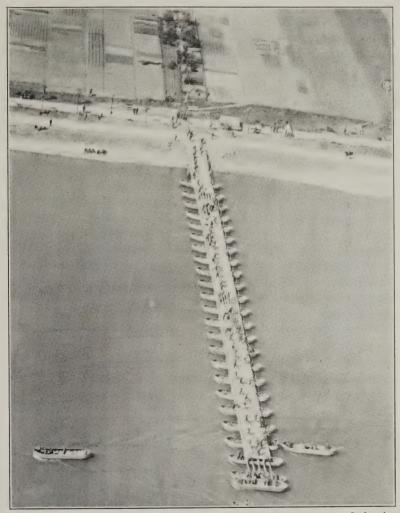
Photograph taken from the air at a height of 200 meters and showing west end of the bridge under construction.
